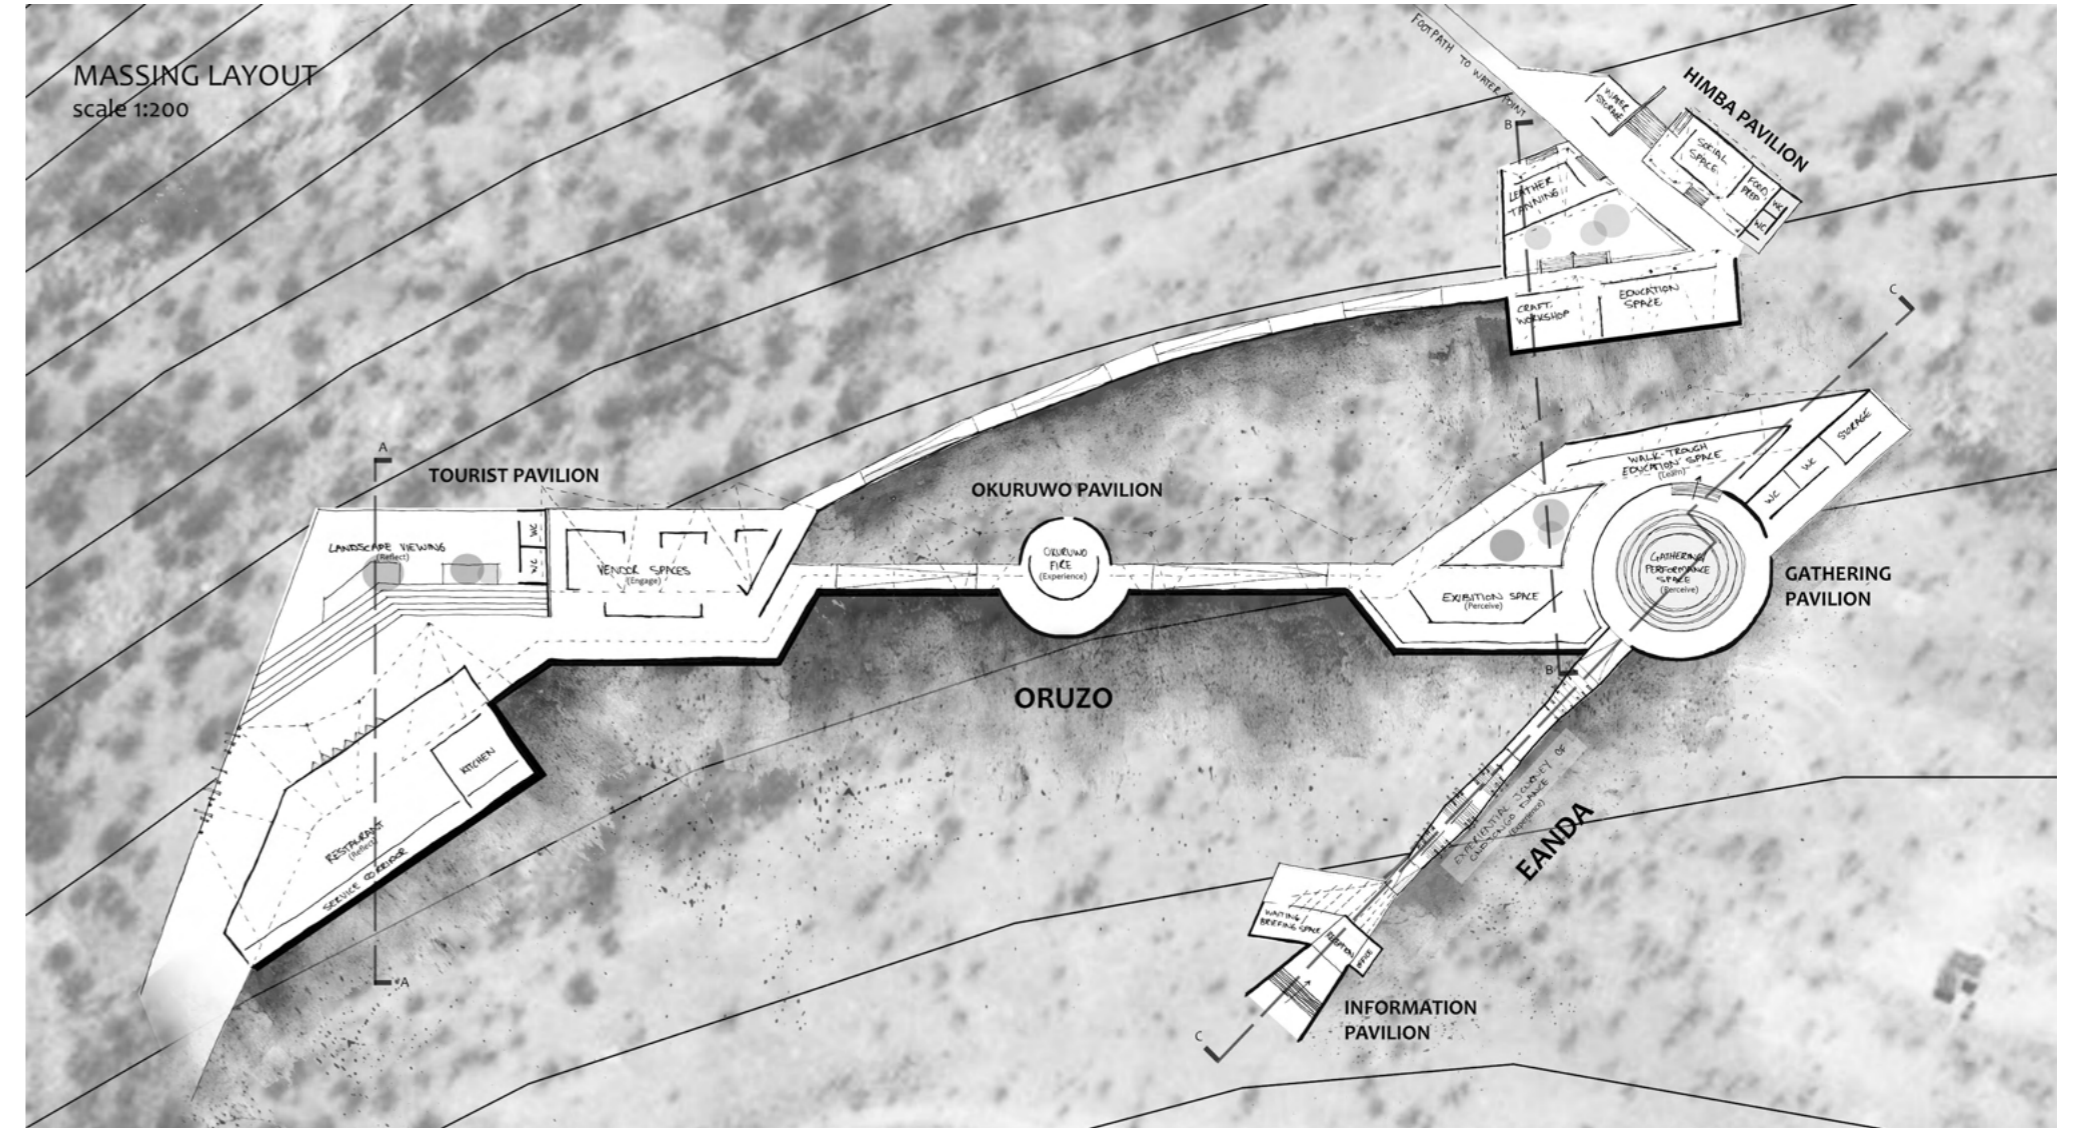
Design Approach 1 Plan Layout (Author, 2021)
